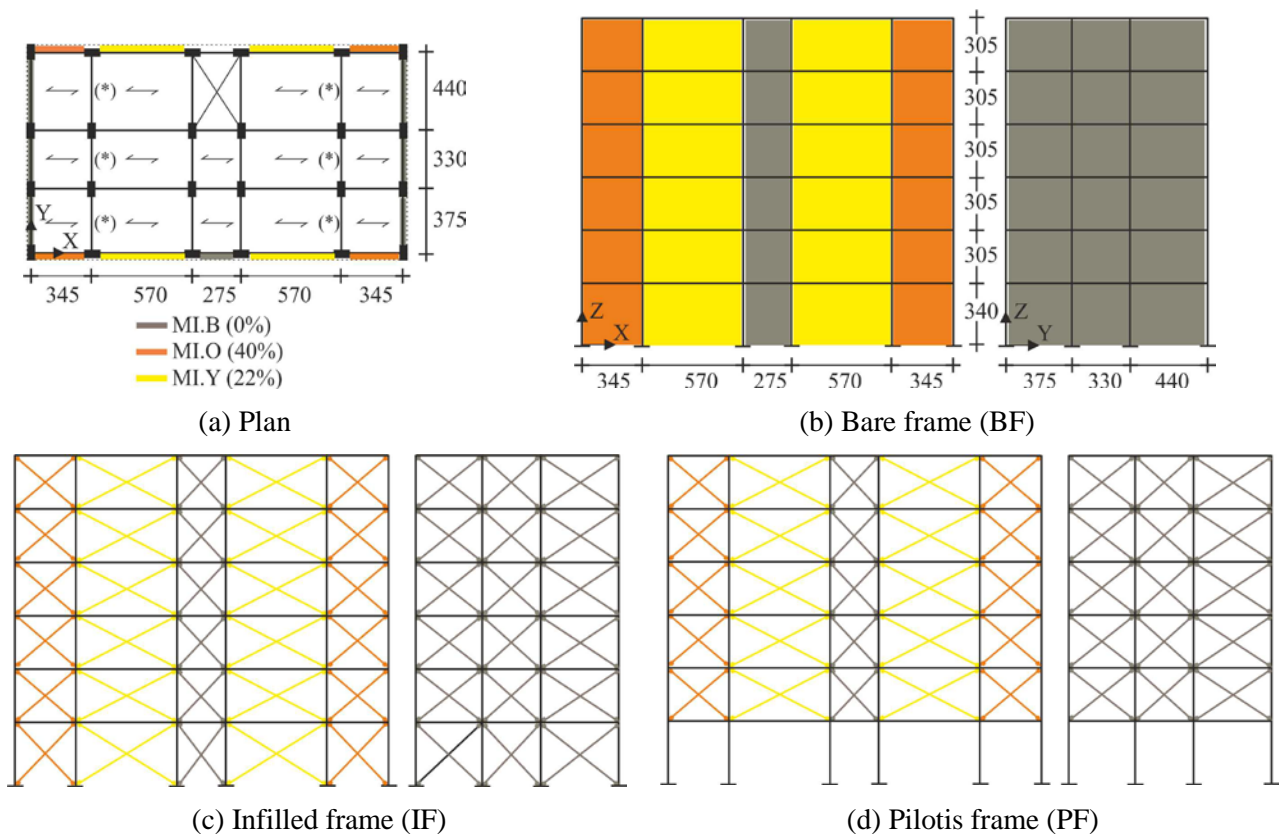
Alternative layouts of the original test structure (unit in cm)
